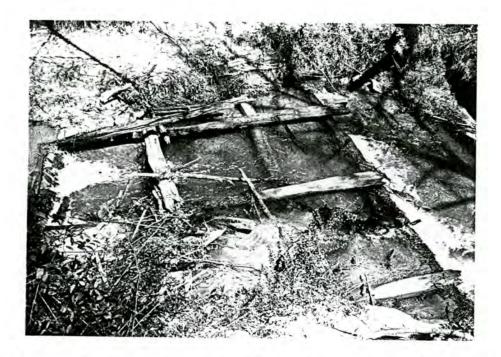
Remains of Stone Foundation and Framing Members of Mill Building in Canoe Creek Just Above J.D. Pitts Dam, Facing North Northwest from South Bank of Canoe Creek
